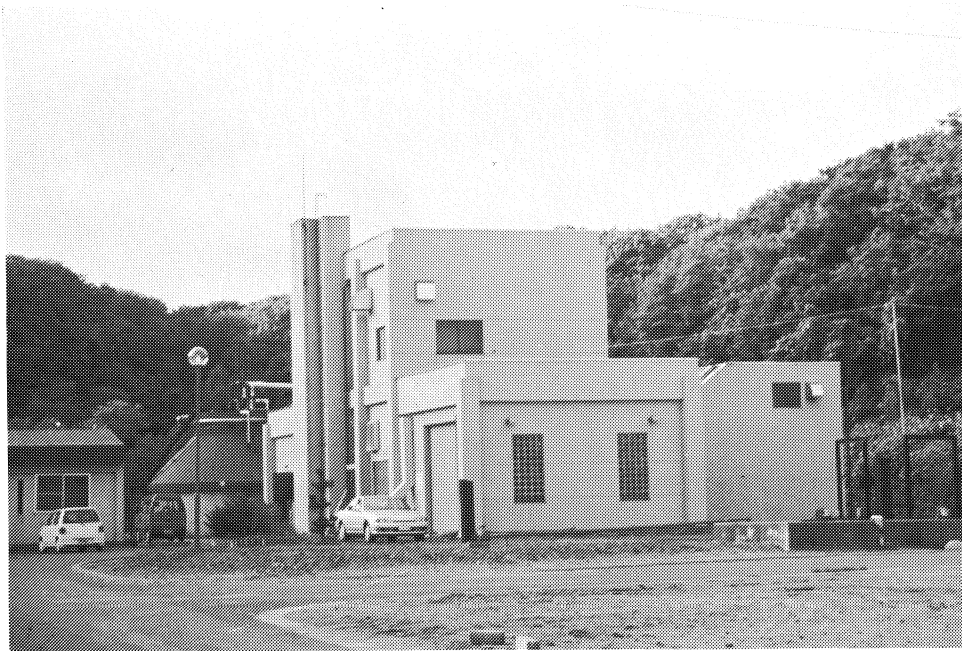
Aonae Sewage Treatment Plant (ASTP). The plant is located just north of the town, on soft soil and behind natural sand dunes, which prevented the tsunami from directly affecting the plant. The structures suffered light, easily repairable damage from settlement and pounding. Some unanchored equipment tipped over, but overall, the direct earthquake damage was small.
